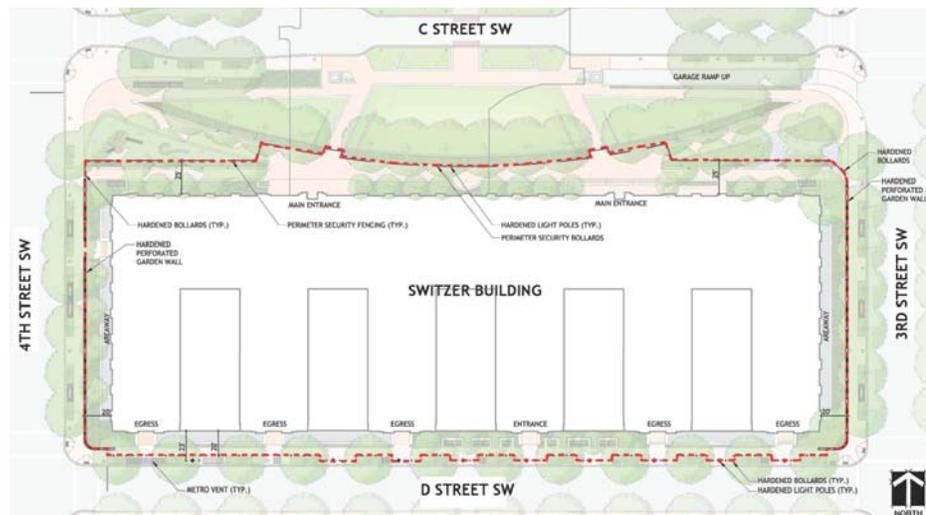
Illustration of proposed perimeter security proposal showing location of security elements
